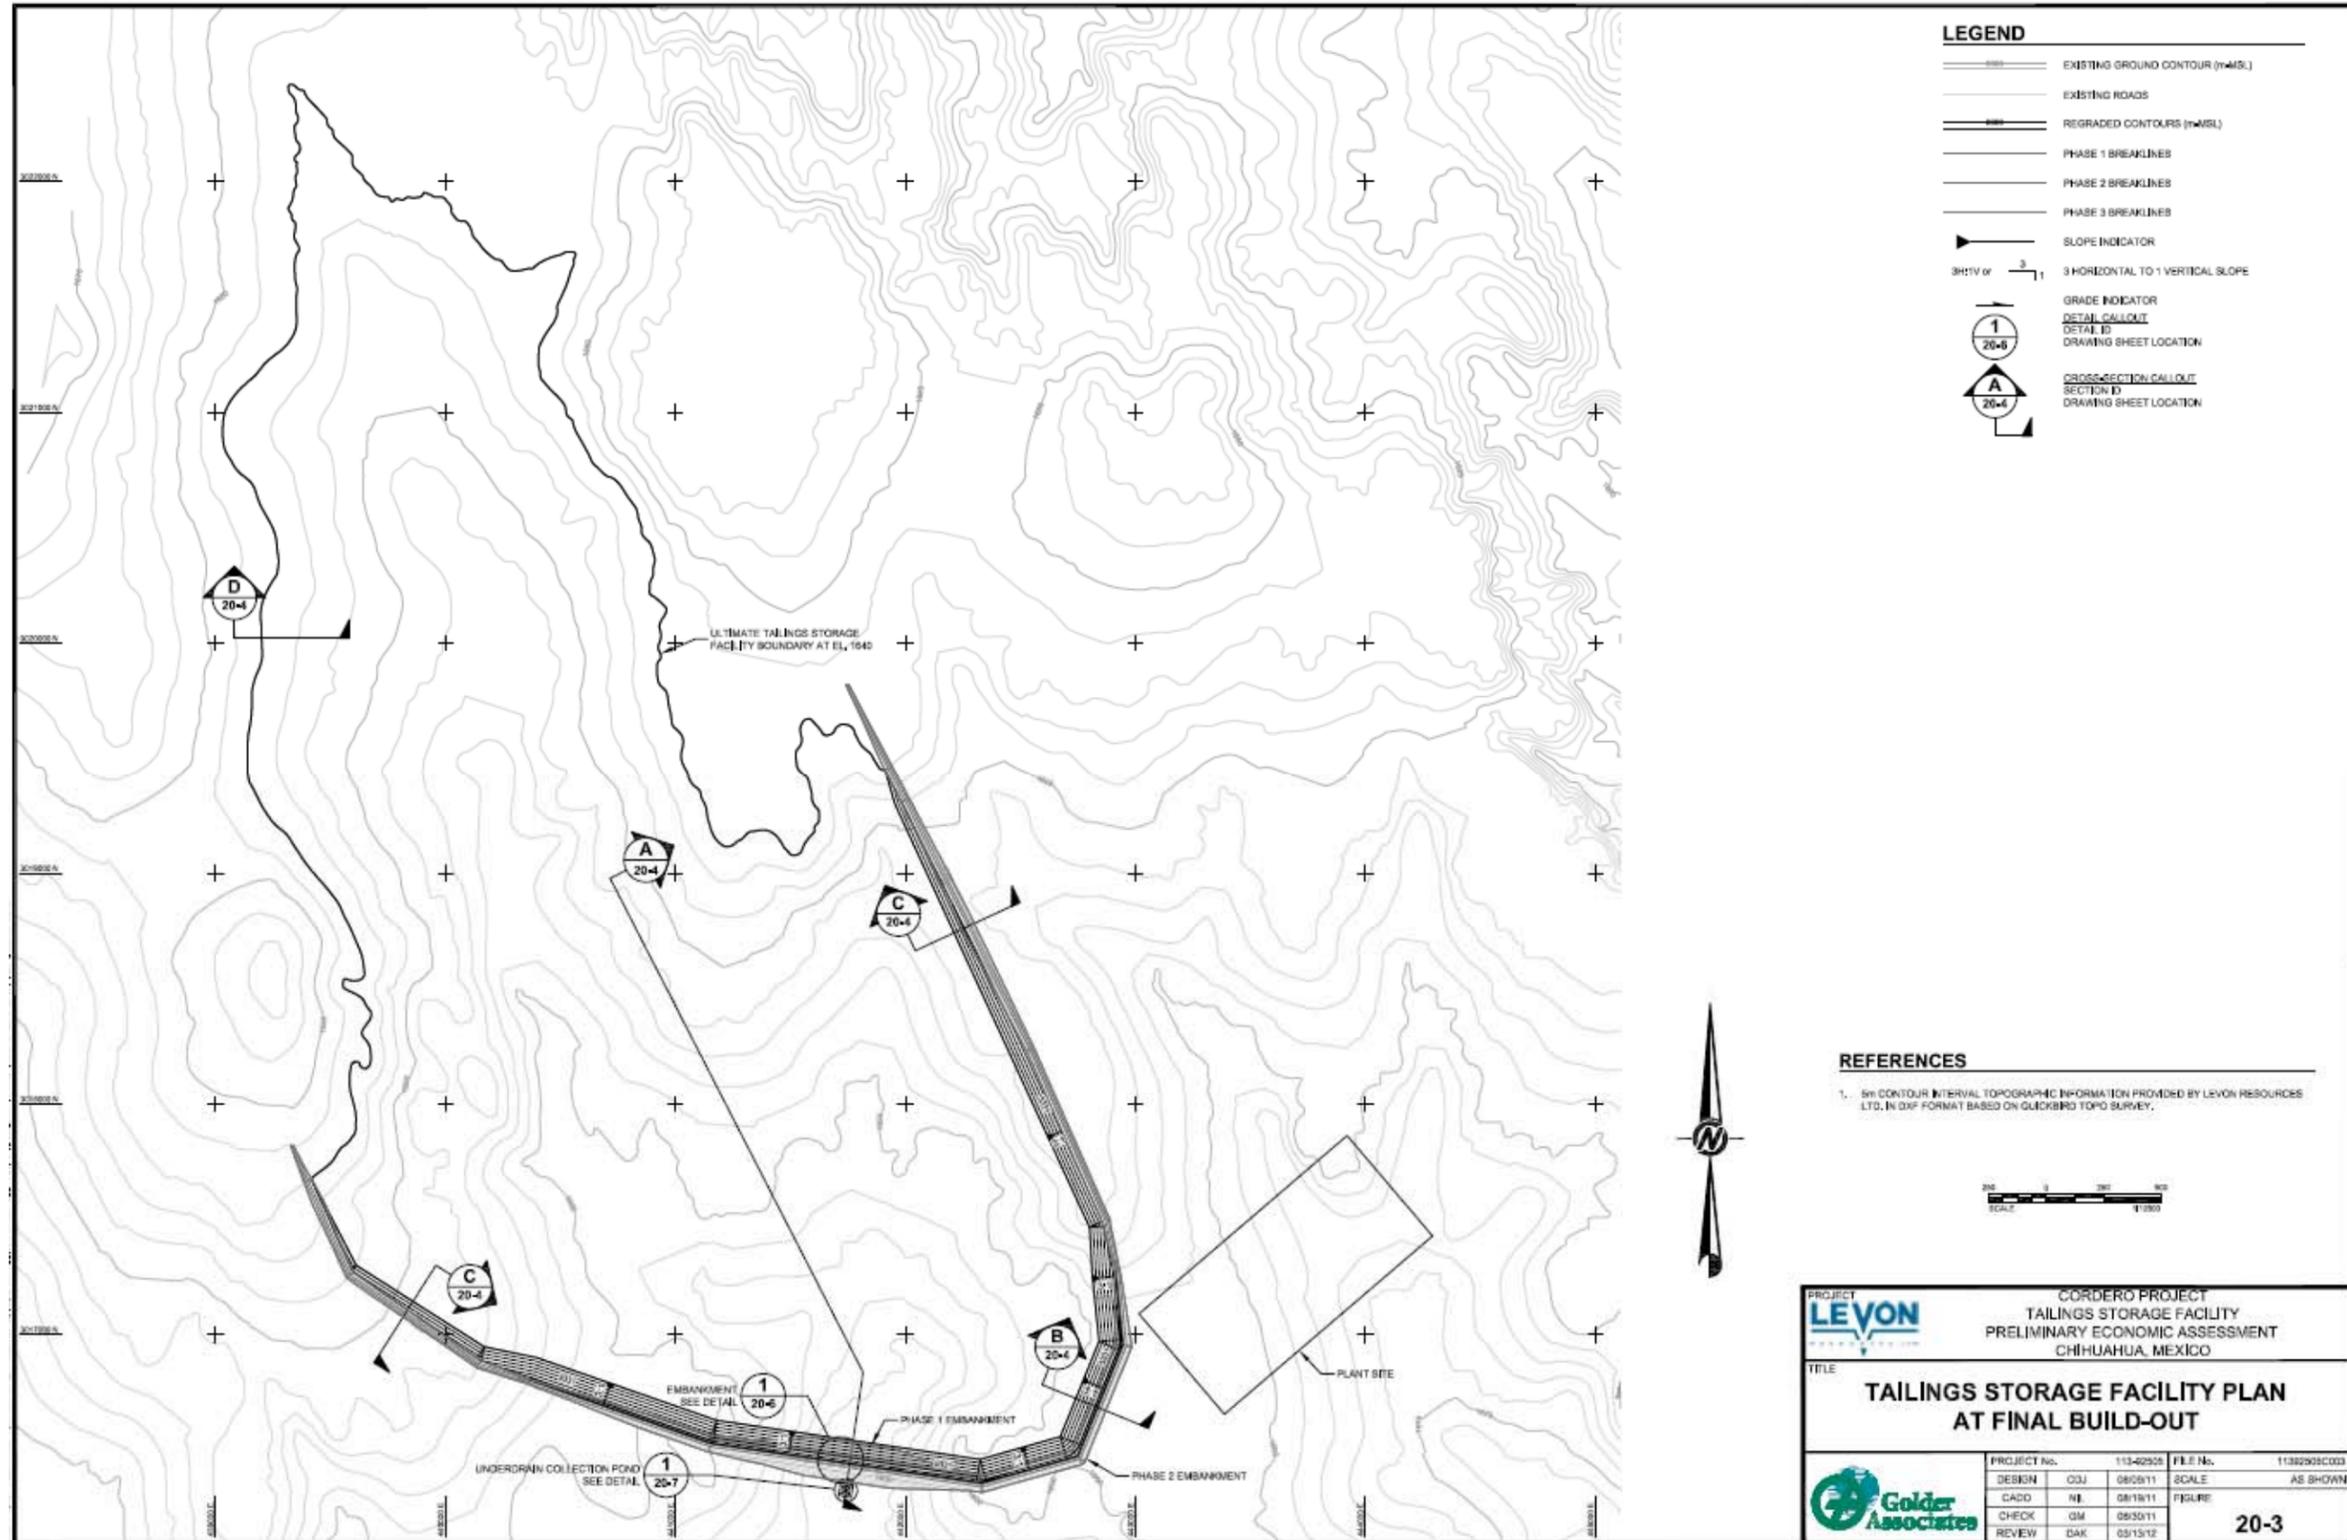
Tailings Storage Facility Plan at Final Build-Out
